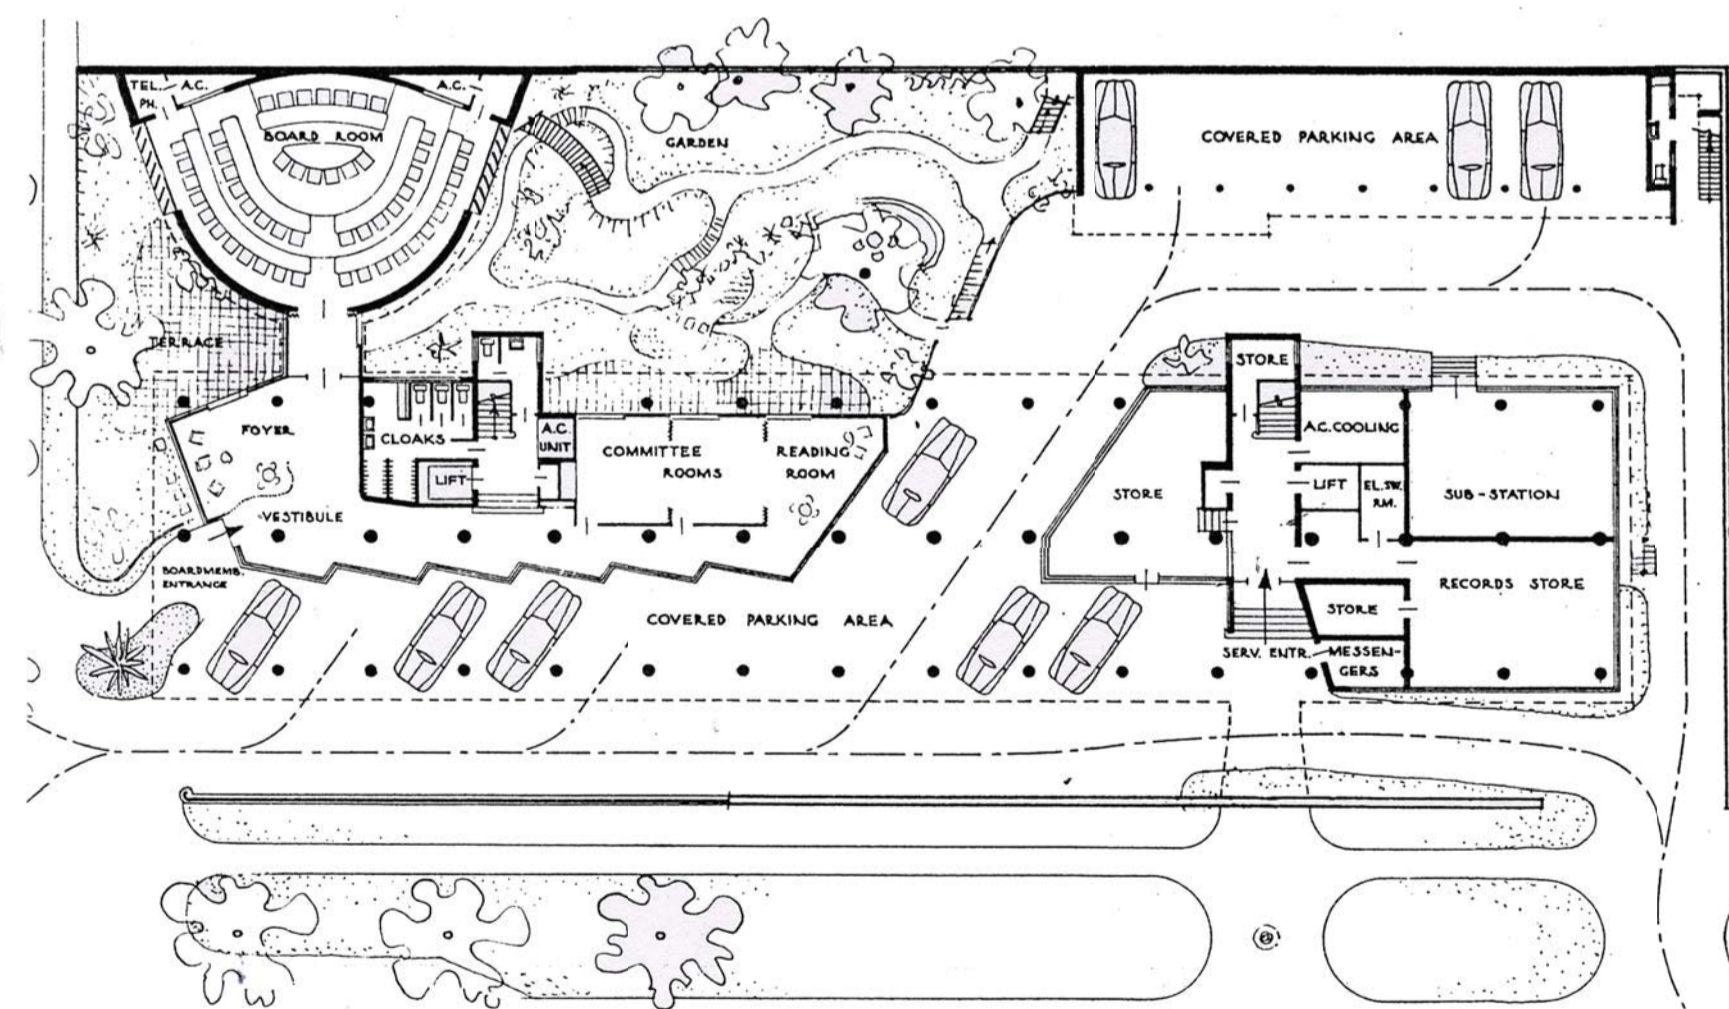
Original lower ground floor plan by Stauch (Stauch 1951:4)
